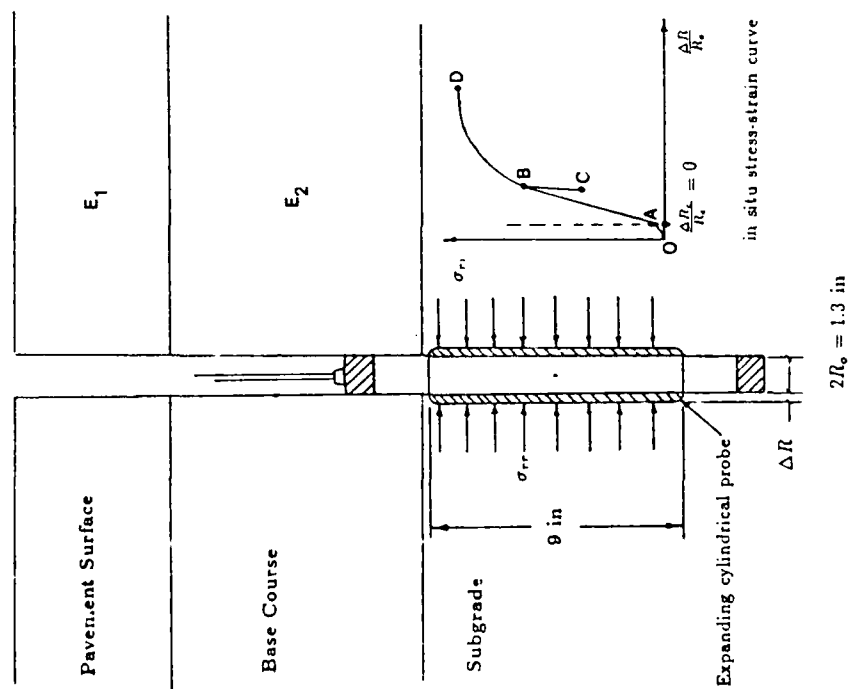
Typical Pavement Pressurimeter Test and Pavement Cross Section
